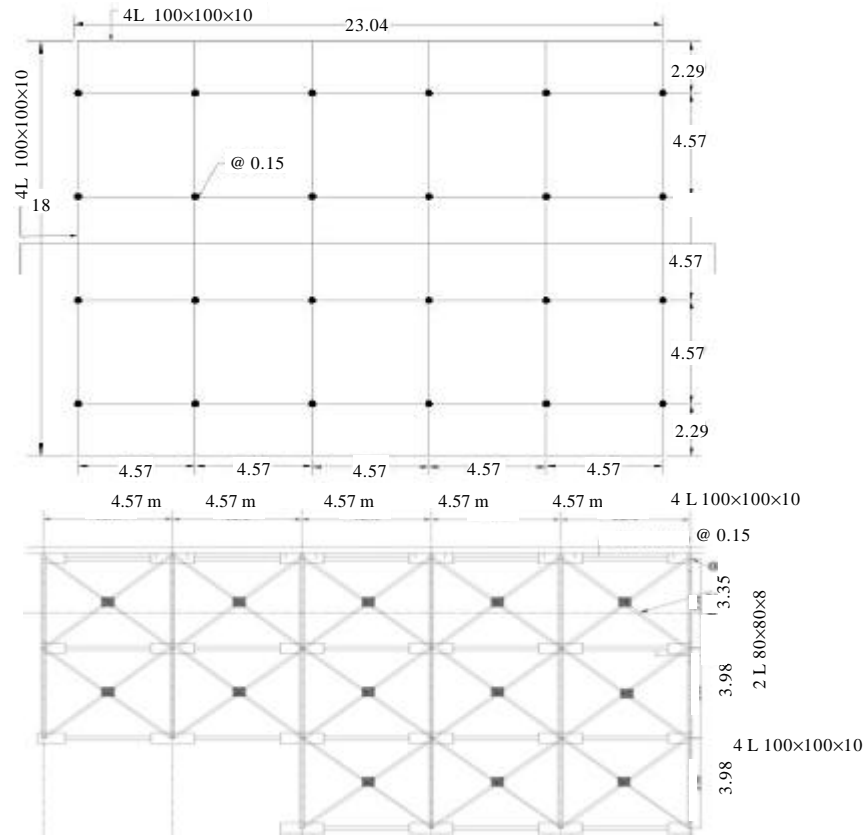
Plan, cross-sectional view and details of section of the East Pile-Deck Wharf of Imam Khomeini Port in construction state
